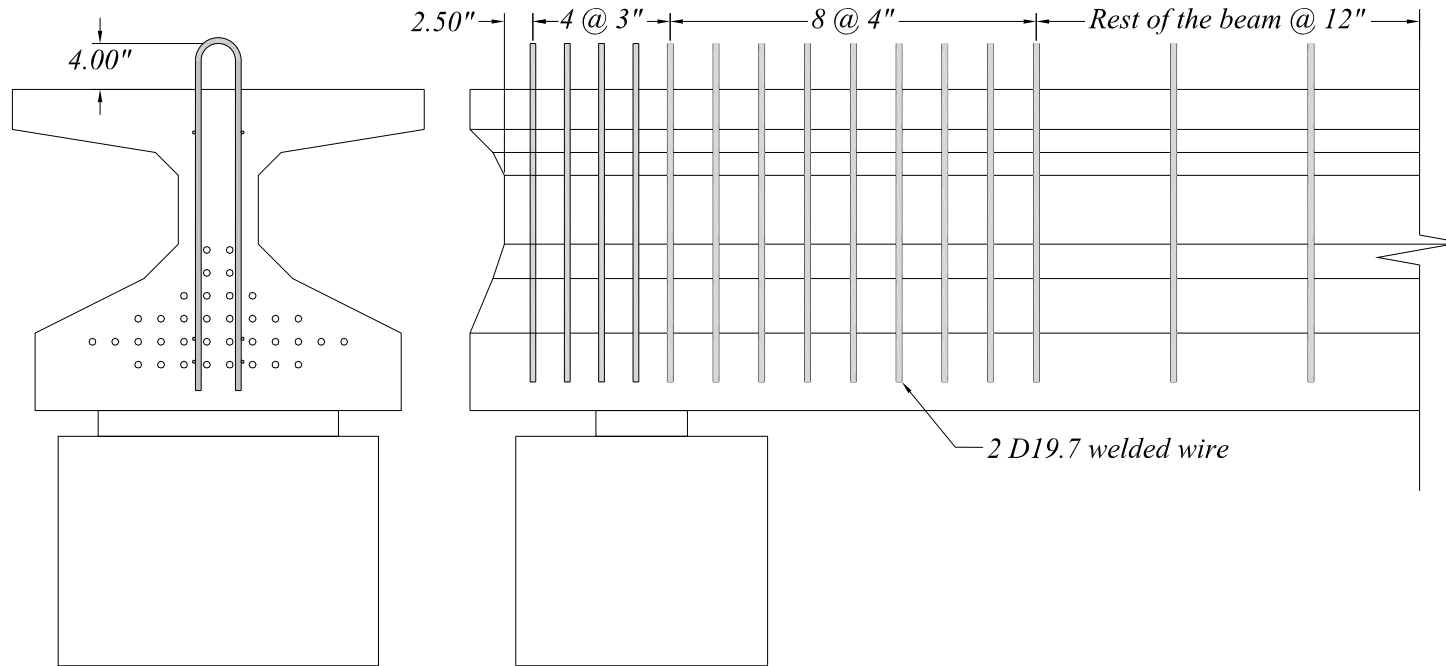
3: Prefabricated welded-deformed rebar
